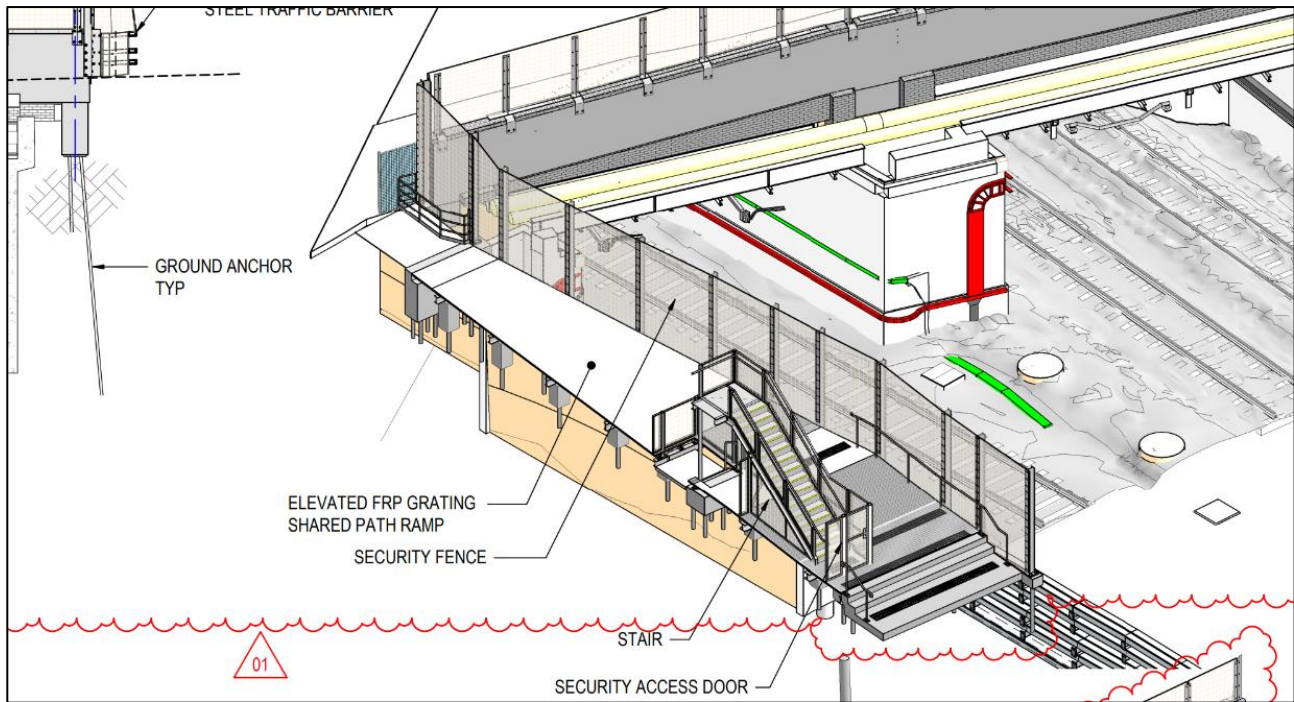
3D render of the proposed replacement staircase (Source: Aurecon, 2025)
